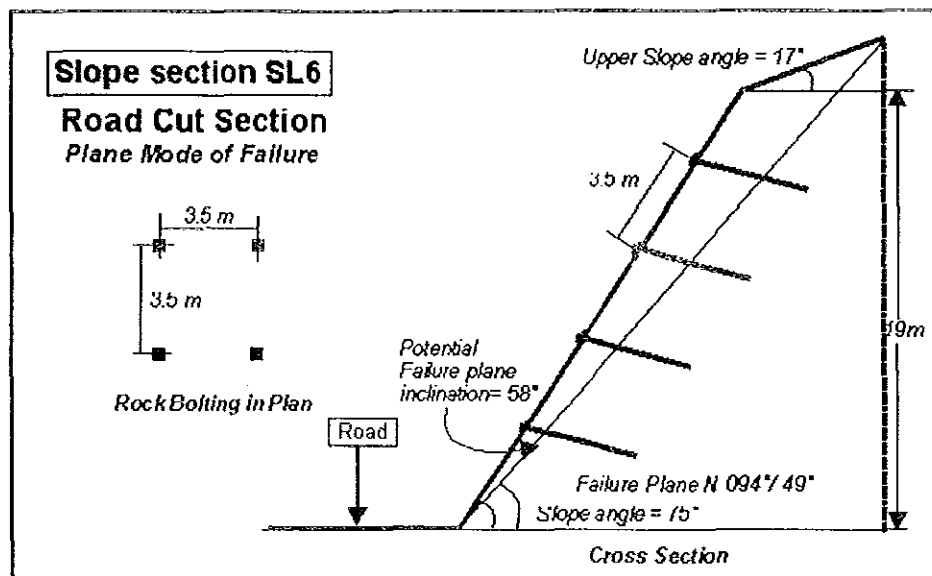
Rock bolt plan for Slope Section SL6 Designed for Anticipated Adverse Condition
